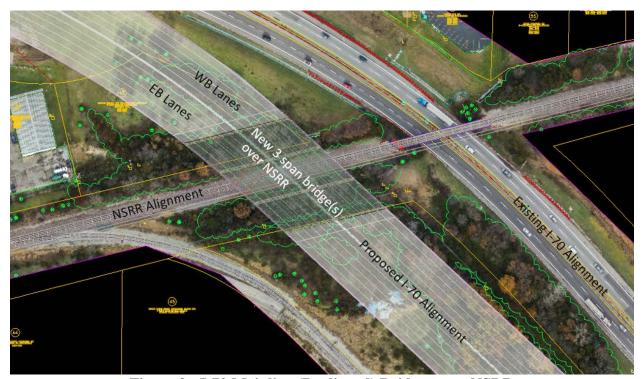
I-70 Mainline (Realigned) Bridges over NSRR
